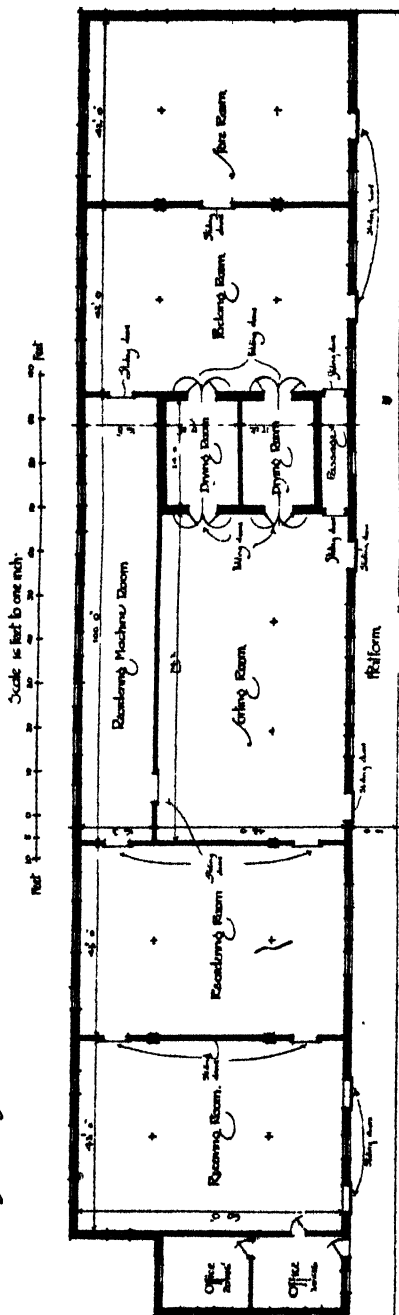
Plan of Central Tobacco Warehouse, Pretoria.
